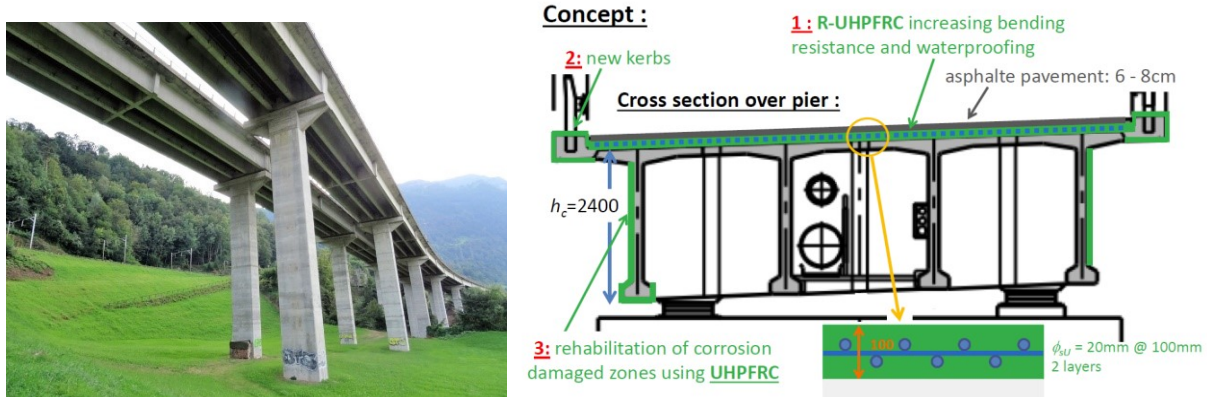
a) View of one of the three twin viaducts; b) Intervention concept (cross section at pier)
